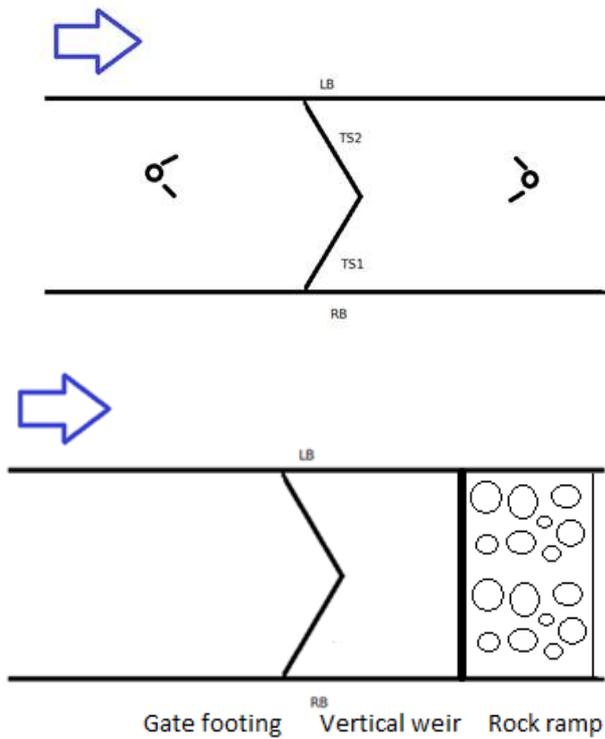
(above): Site plan for Tidal Crane Barrier 1
